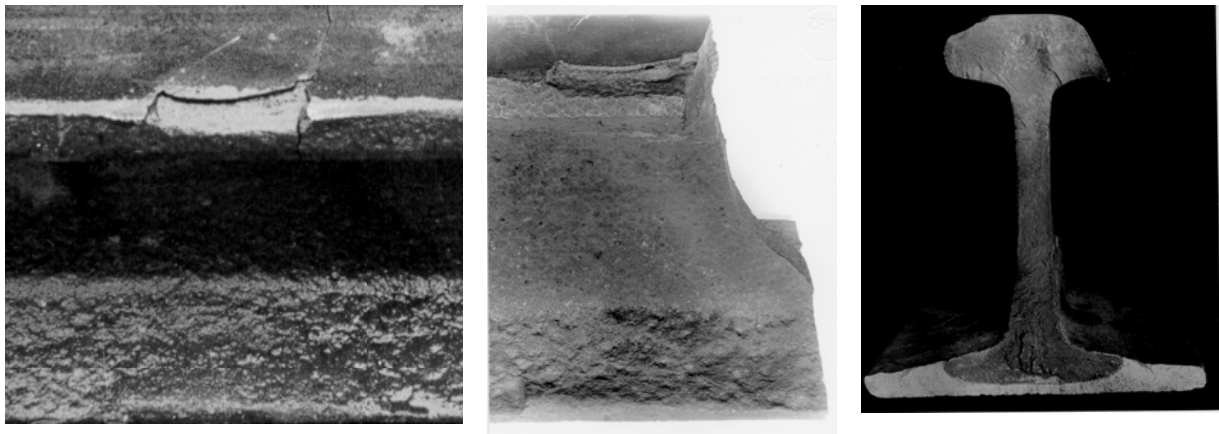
Transverse crack propagation (detail fracture) starting from gauge corner shelling. Left: damaged rail section of the dismantled rail; Centre: side view of the rail, now broken open; Right: View of the fracture surface. It can be seen that the transverse crack propagated as far as to the rail foot.
